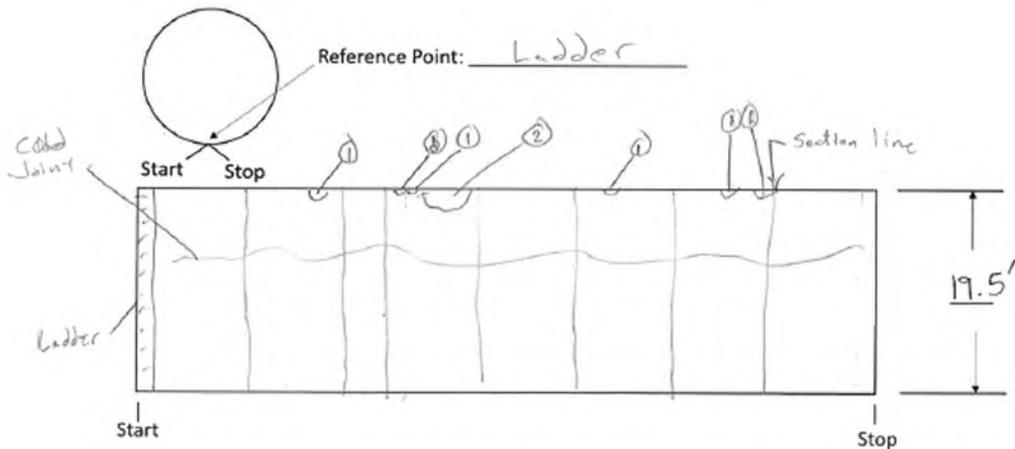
Reservoir INTERIOR WALL Elevation- Note location of ladders and other features.
